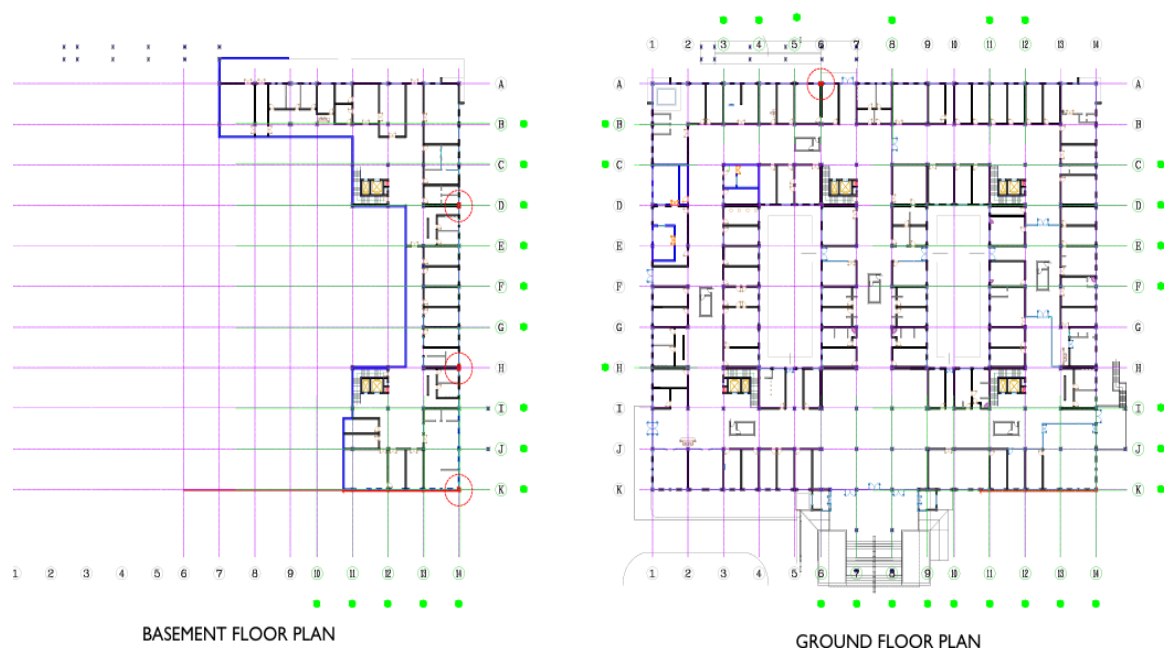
As-built Column Deflections for BASEMENT and Ground Floor Plans
